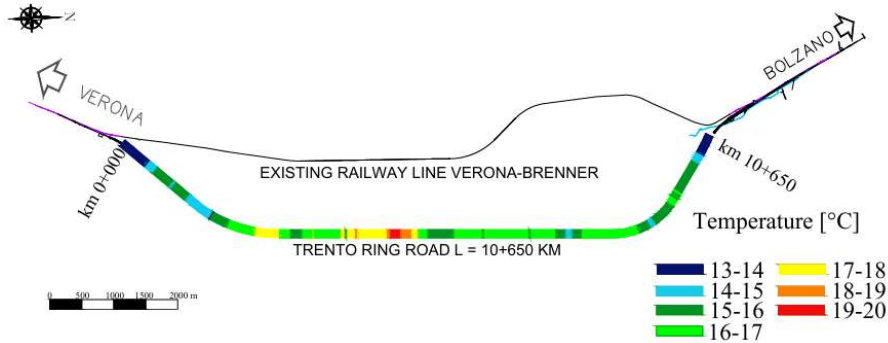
Plan view of the temperature classes along the tunnel chainage – Trento ring road tunnel
